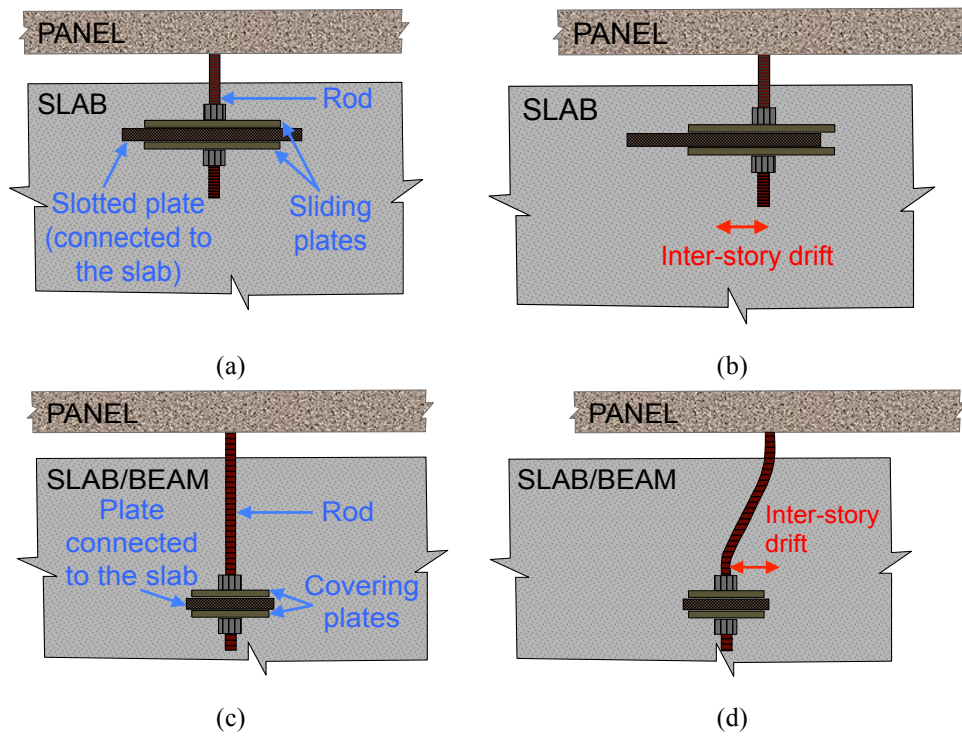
PCCP connections between structural skeleton and panel (schematic on left, desired behavior on right): (a), (b) sliding rod connection, and (c), (d) flexing rod connection.
